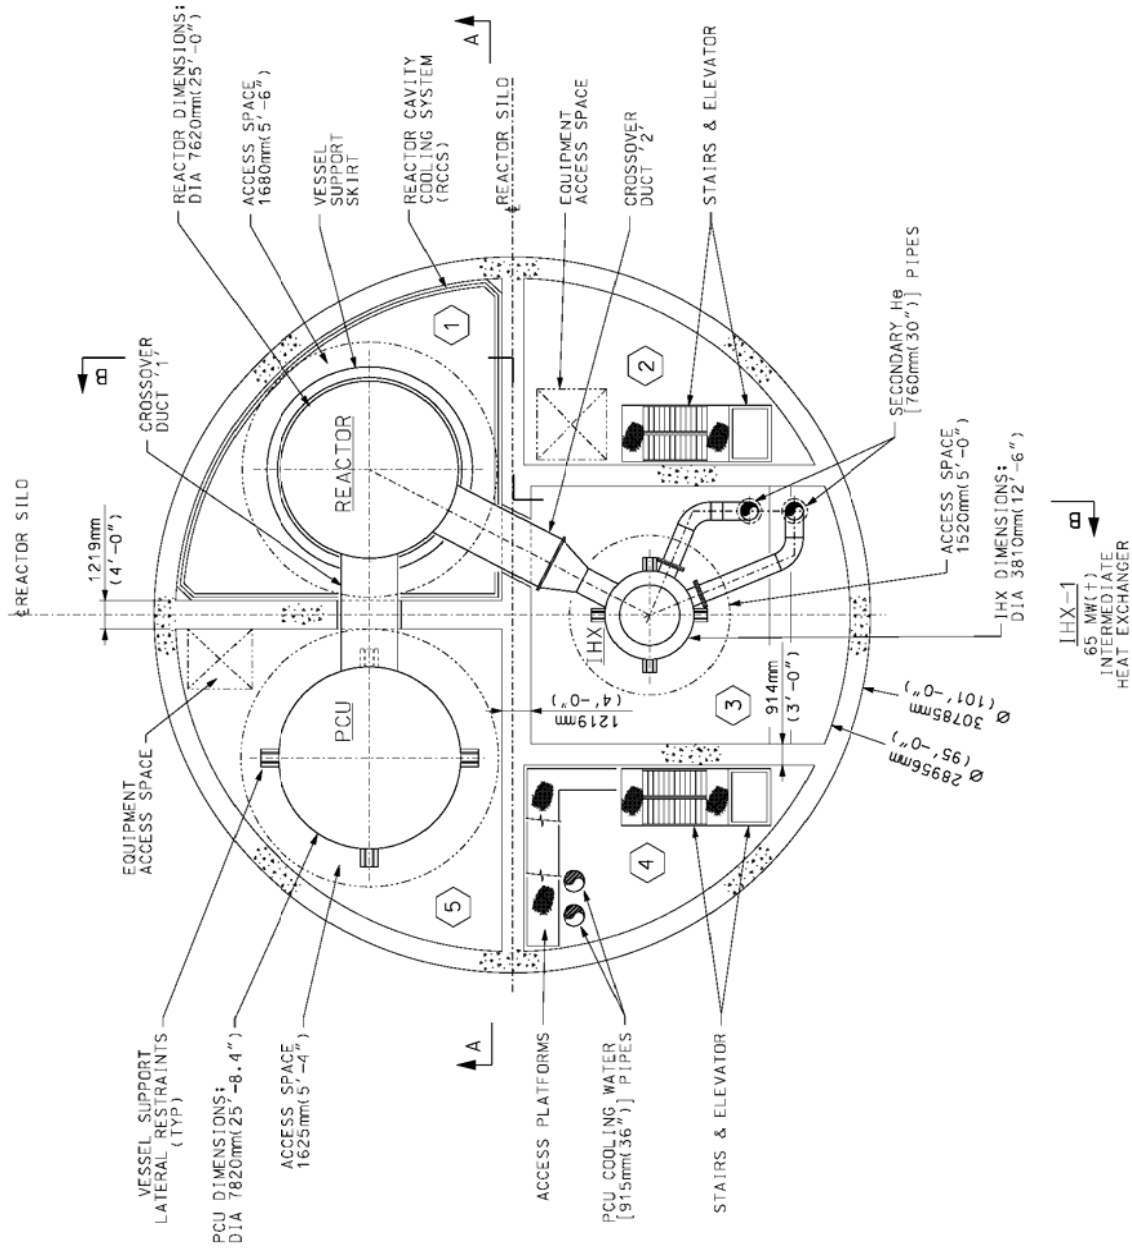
Plan View of Reactor Building – Elevation -93' -0"
